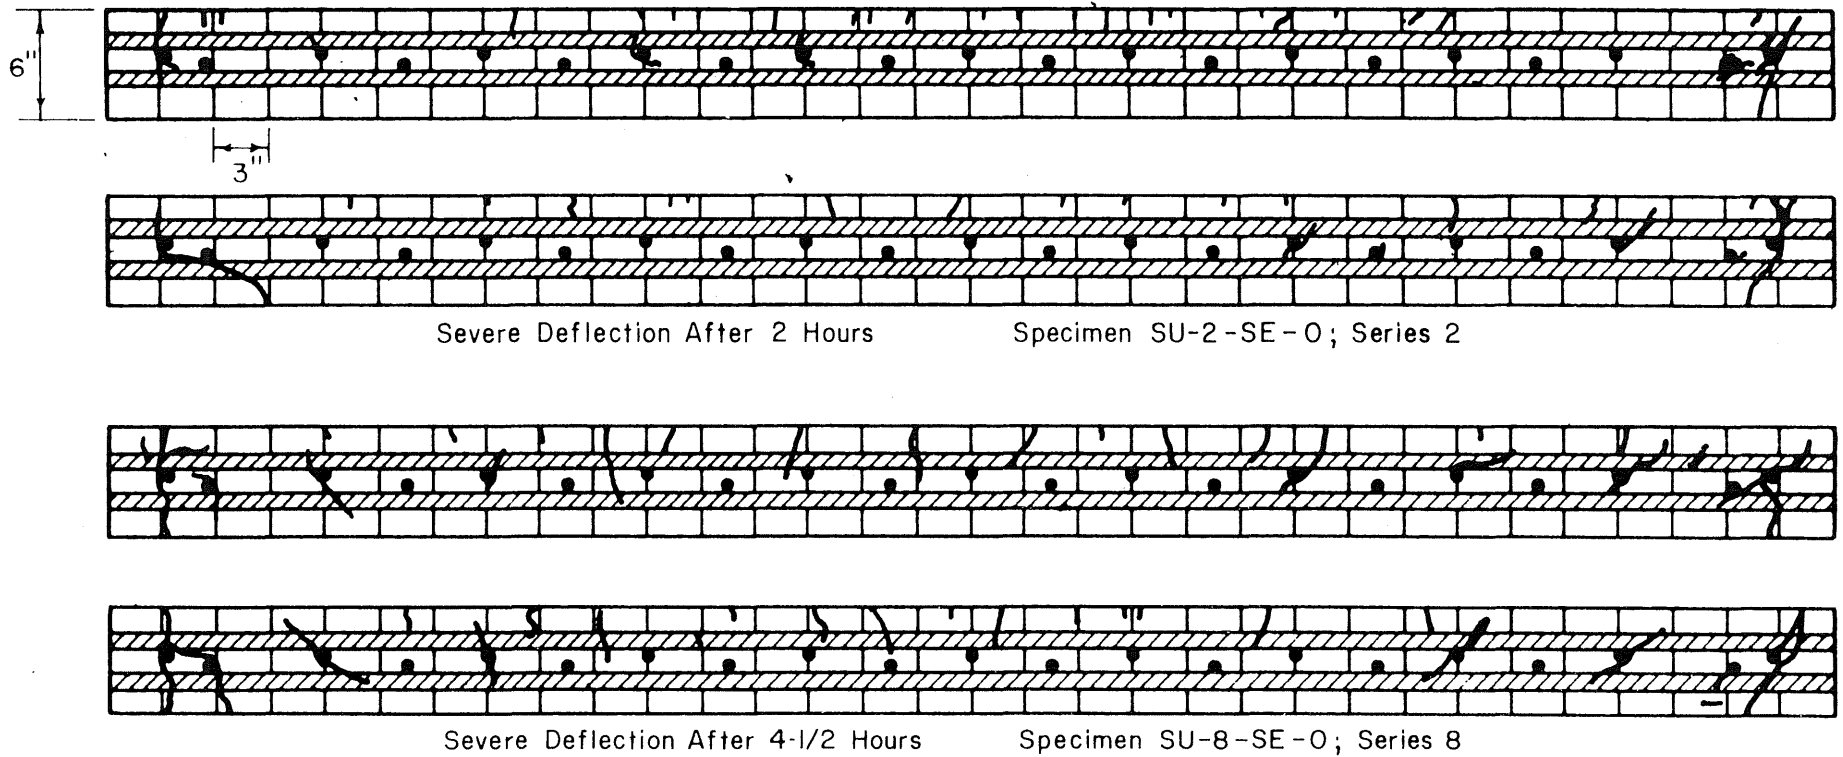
FIG. CII SECTIONS OF SEVERELY CRACKED CONCRETE SLABS; TIME OF DEFLECTION: 2 HOURS AND 4-1/2 HOURS AFTER MIXING
